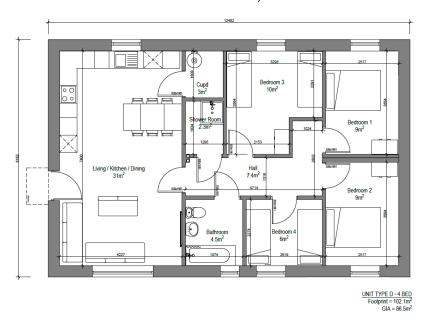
Approved Plan – Unit Type D-B Accessible General Arrangement Plan (affected plots 6, 14, 16, 18 and 21)
